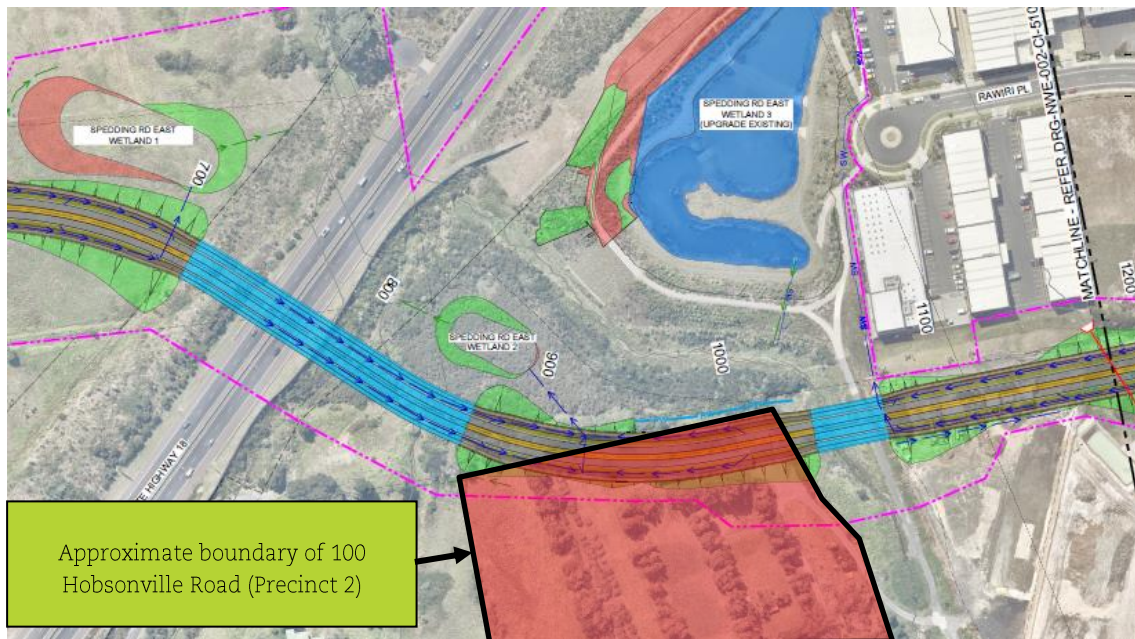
INDICATIVE LAYOUT OF THE PROPOSED PLAN CHANGE
